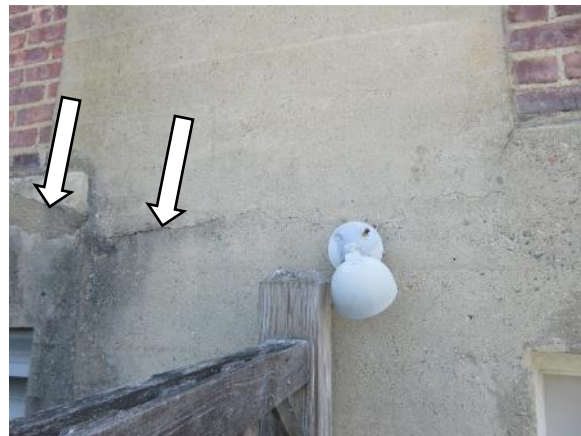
Patched spall and cracking (arrows) occurring between portions of brick
